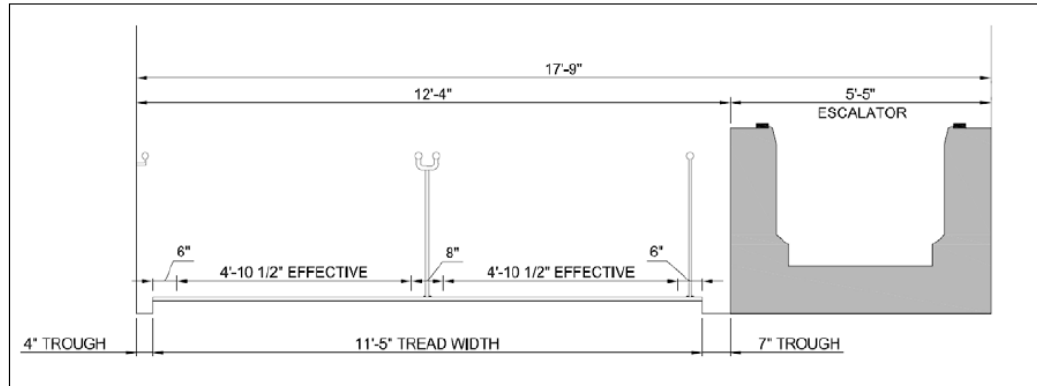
Existing Cross Section of Stair S2/P2 providing detail of effective stair width.
